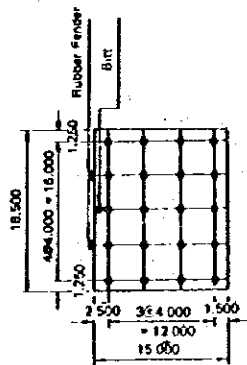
Typical Section of Bulk Cargo Wharf
